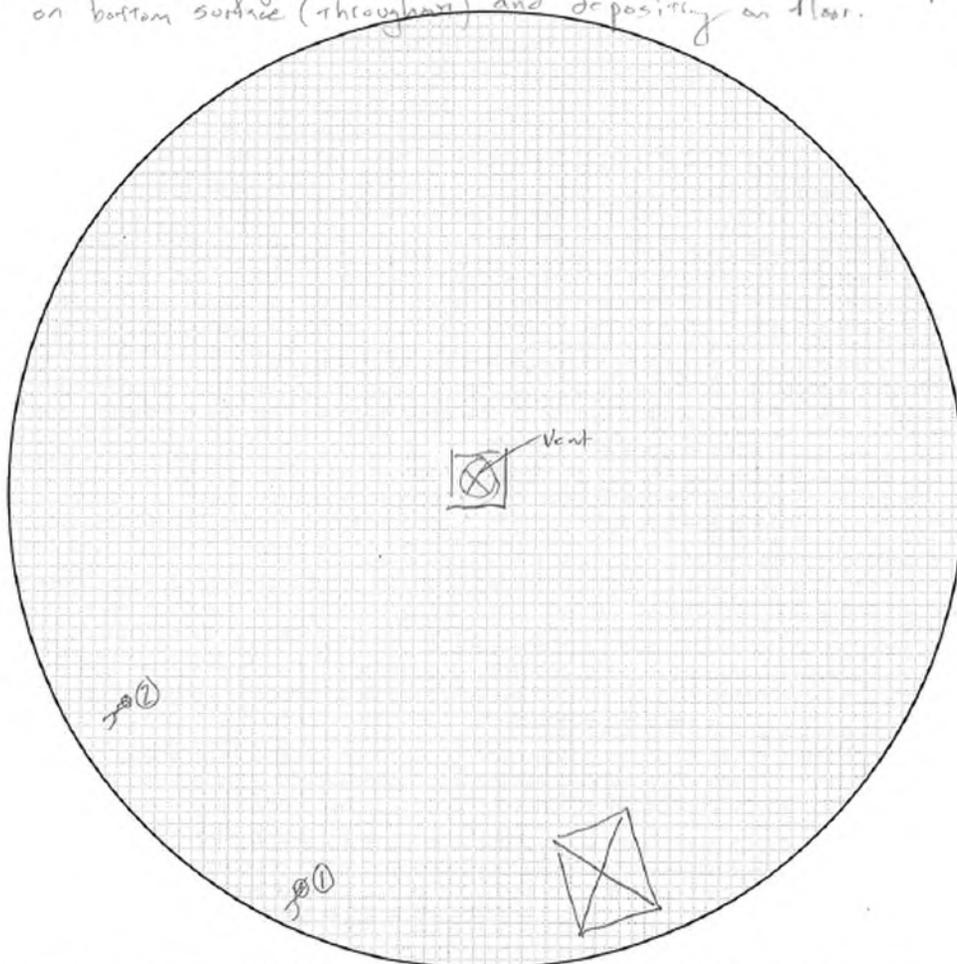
Reservoir INTERIOR REFLECTED ROOF Plan – Note location of columns, hatches, ladders, and manways (if present). List given and measured diameter. (Note columns on next sheet)
